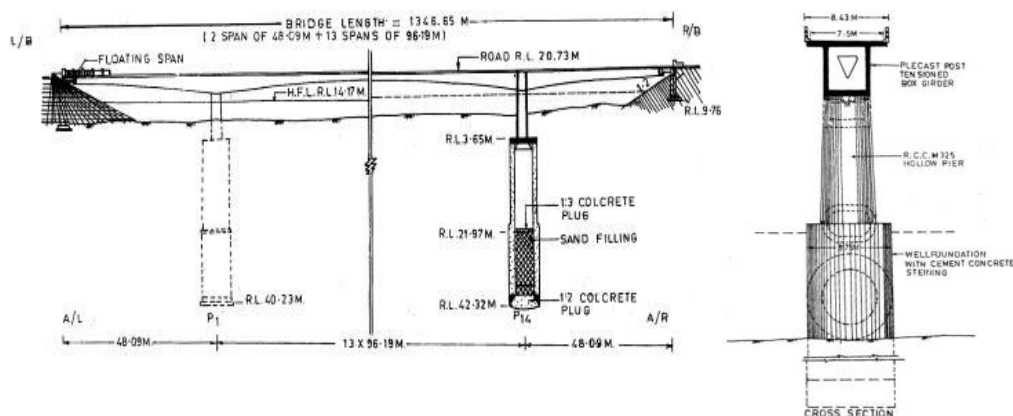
Longitudinal Schematic Section / Elevation of a Segmental Box Girder Bridge
